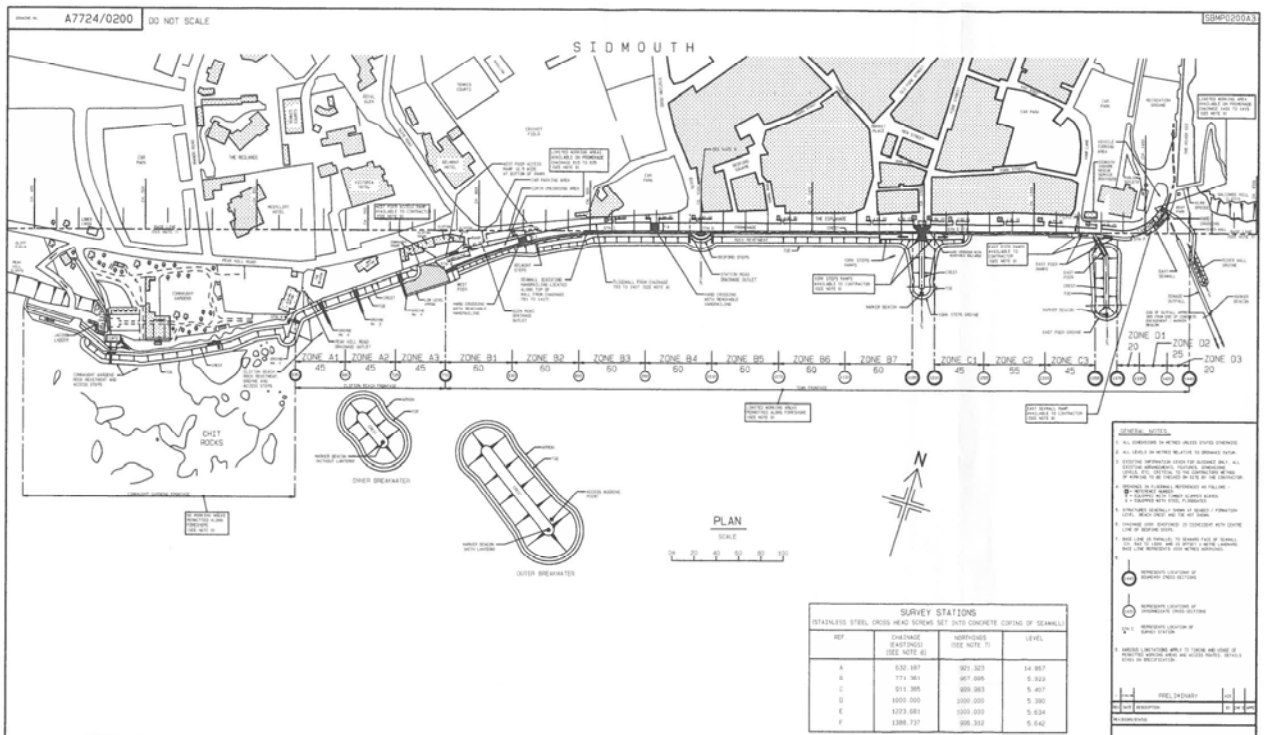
Plan of 1995 Phase II works layout (from Posford Duvivier, 1996)
